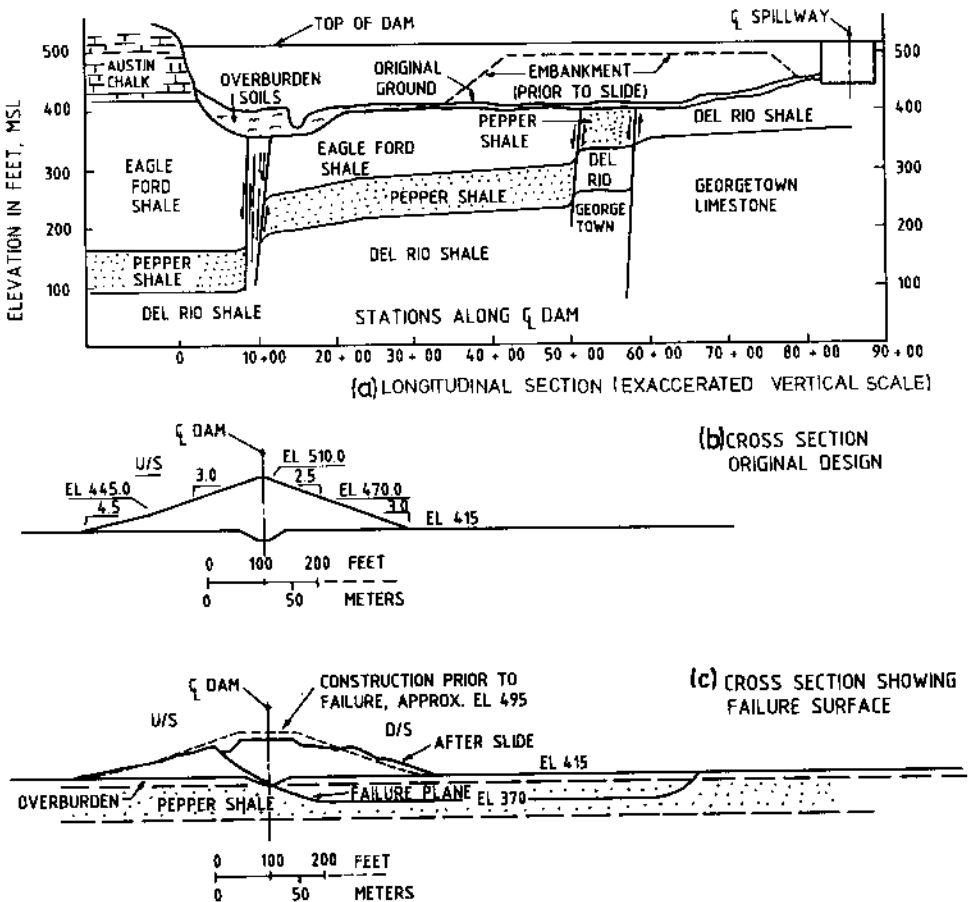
Longitudinal and cross sections, Waco Dam. From Stroman, Beene & Hull (1984).
